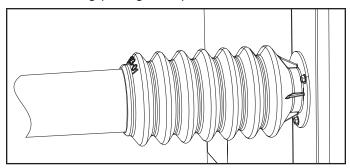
Install Armaflex Over End of Sleeve and Clamp
